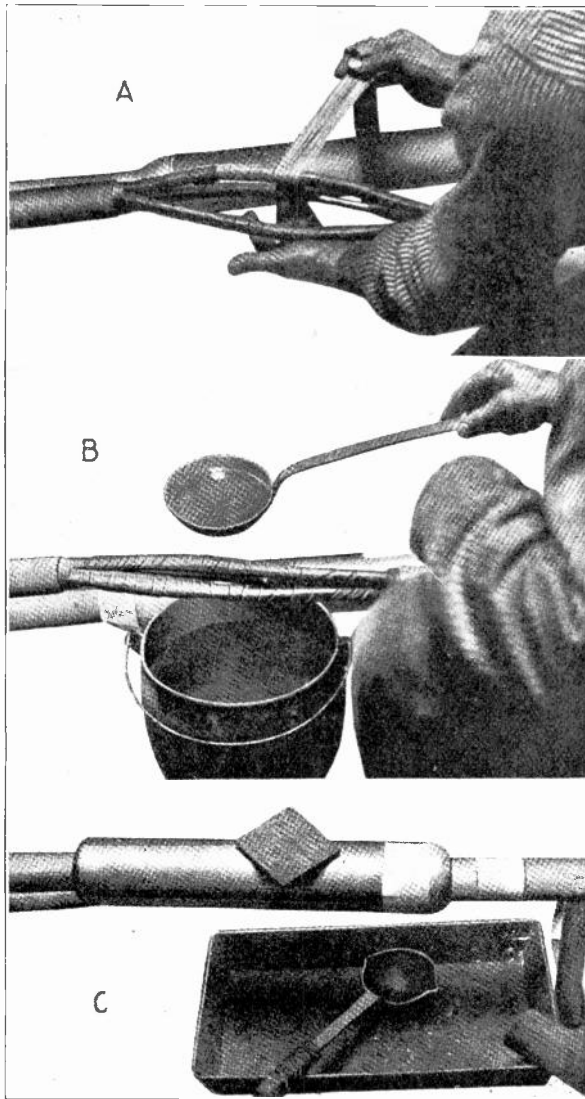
This view shows several of the important steps in splicing lead covered cables.
